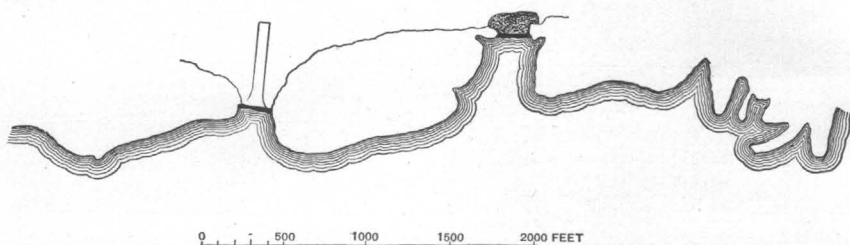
Plan showing relative position of wasteway, rock-filled dam, East Park dam site.
